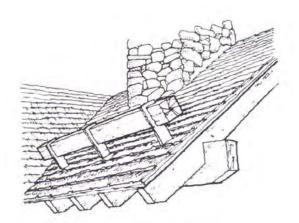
Snowguard details should relate to other architectural elements on the building.
